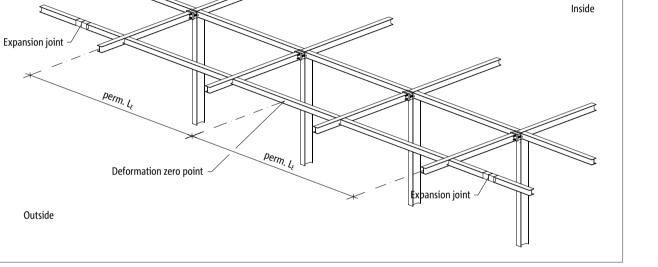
Schöck Isokorb® T Type S: Example showing arrangement of expansion joints
